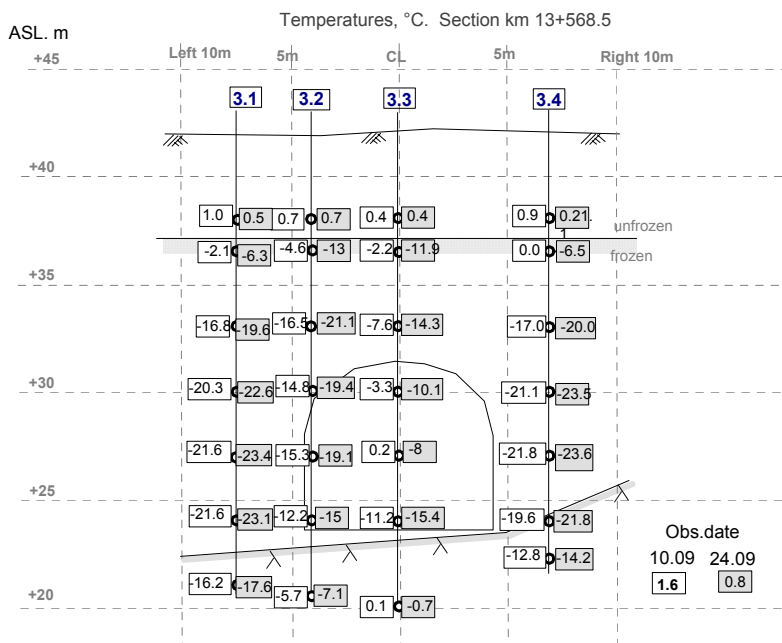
Observations 24.9.2002 and 10.9.2002, Section km 13+568.5.
